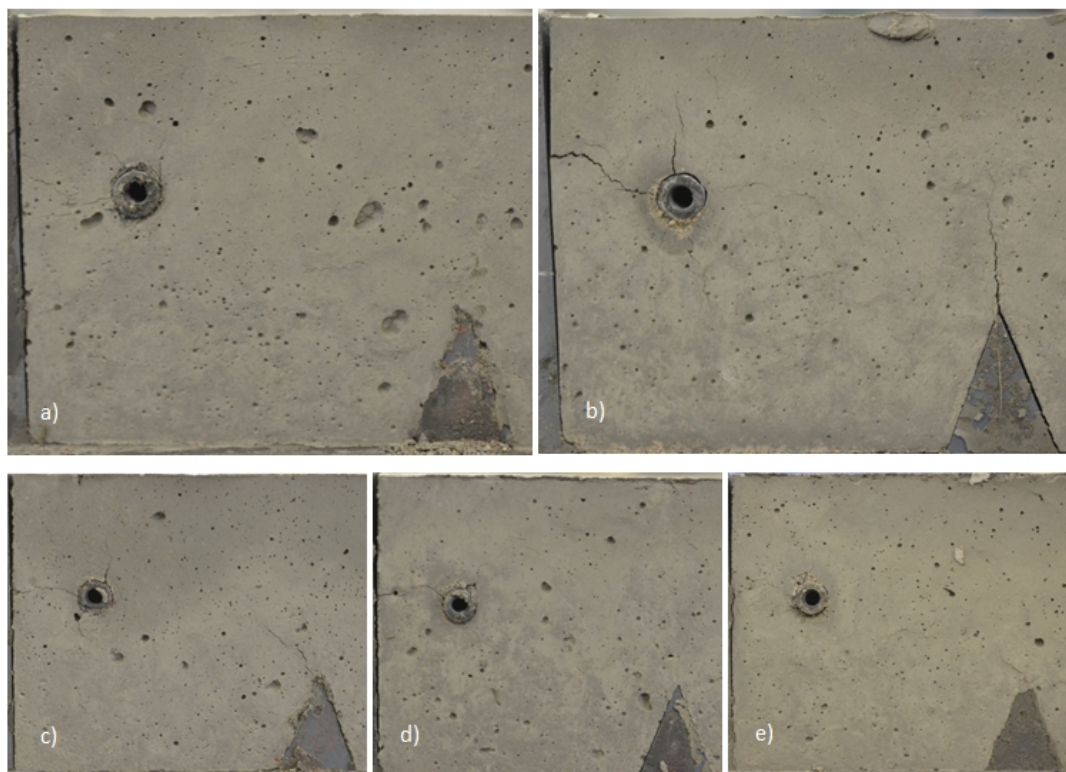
Images of the deformation and cracks at the end restraints as captured from the side with the Perspex side panels removed at 5 hours after casting for Mix C3 at Climate E2 for: a) Normal shrinkage cracking mould with 64 mm bottom triangular insert at centre. b) Modified shrinkage cracking mould with no triangular inserts at centre. c) Modified shrinkage cracking mould with 25mm side triangular inserts at centre. d) Modified shrinkage cracking mould with 50 mm side triangular inserts at centre. e) Modified shrinkage cracking mould with 64 mm side triangular inserts at centre.
